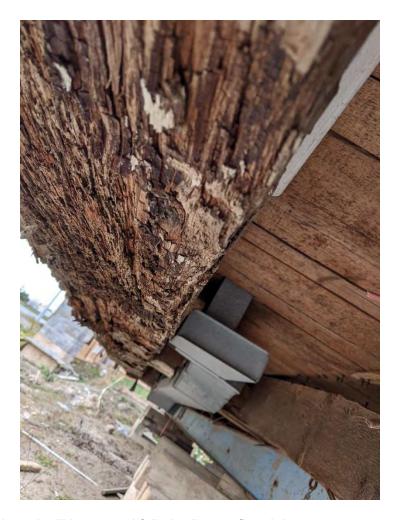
Decayed south sill beam and failed adjacent floor joist.
